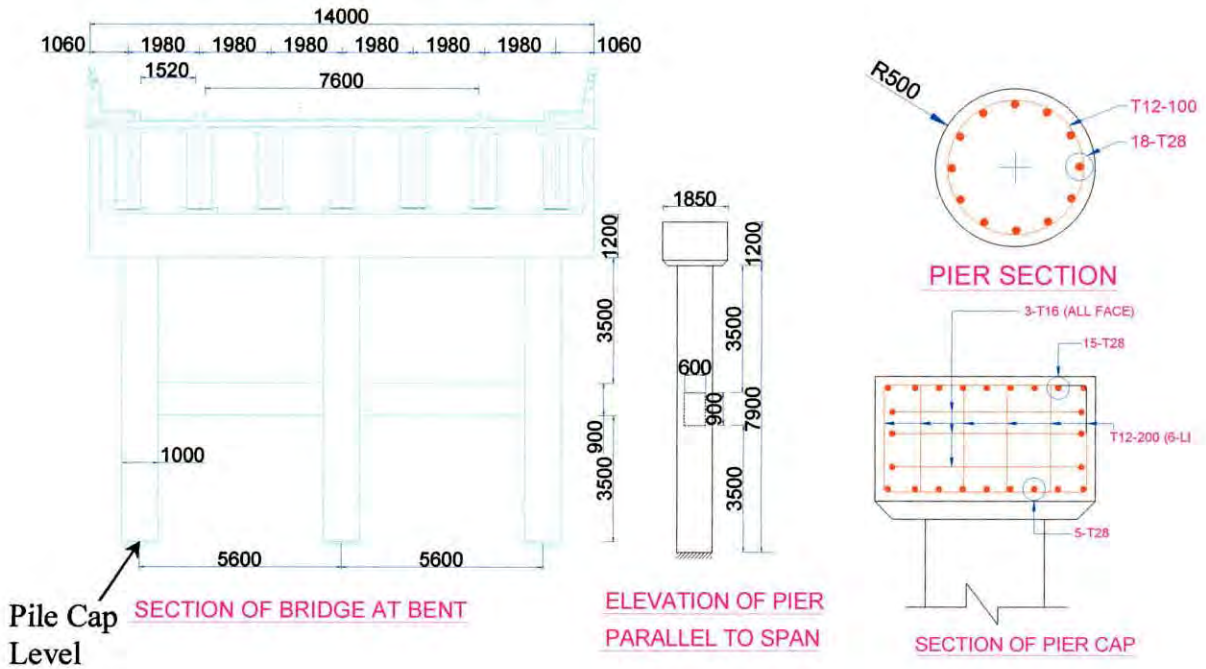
Deck and Pier Sections of Shah Paran Bridge
